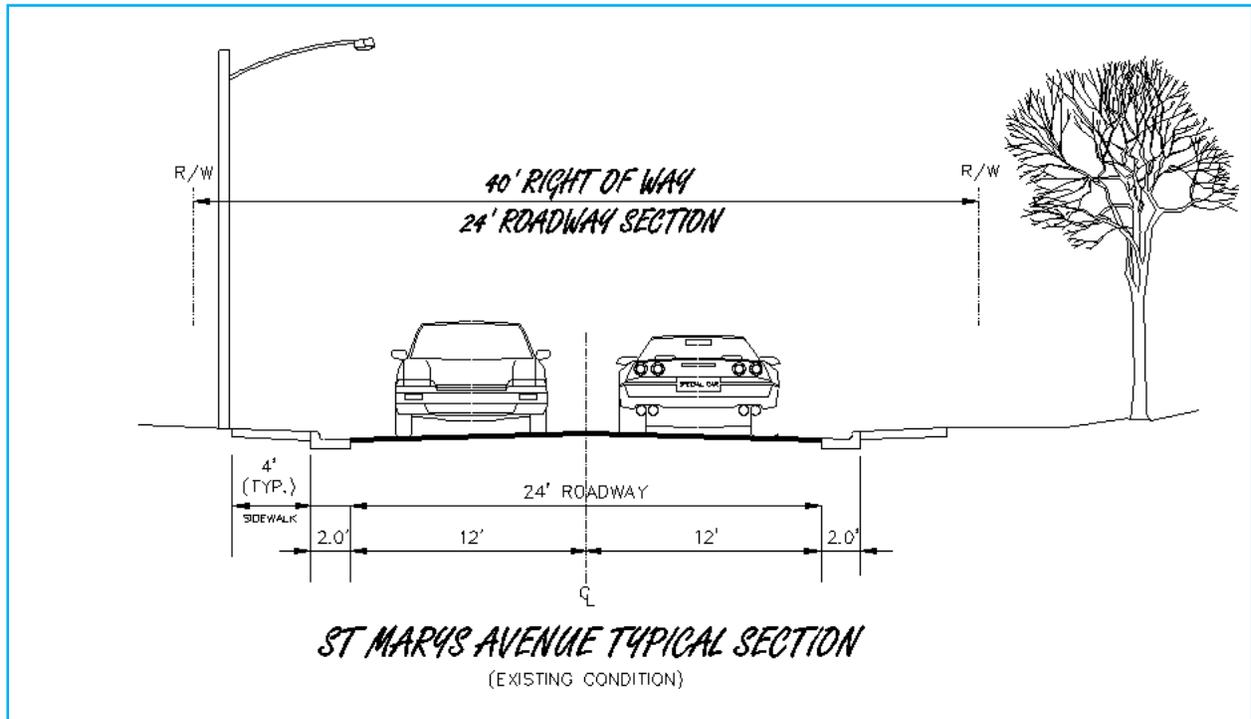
ST MARYS TYPICAL SECTION – 40’ R/W – 24’ PAVEMENT WIDTH
